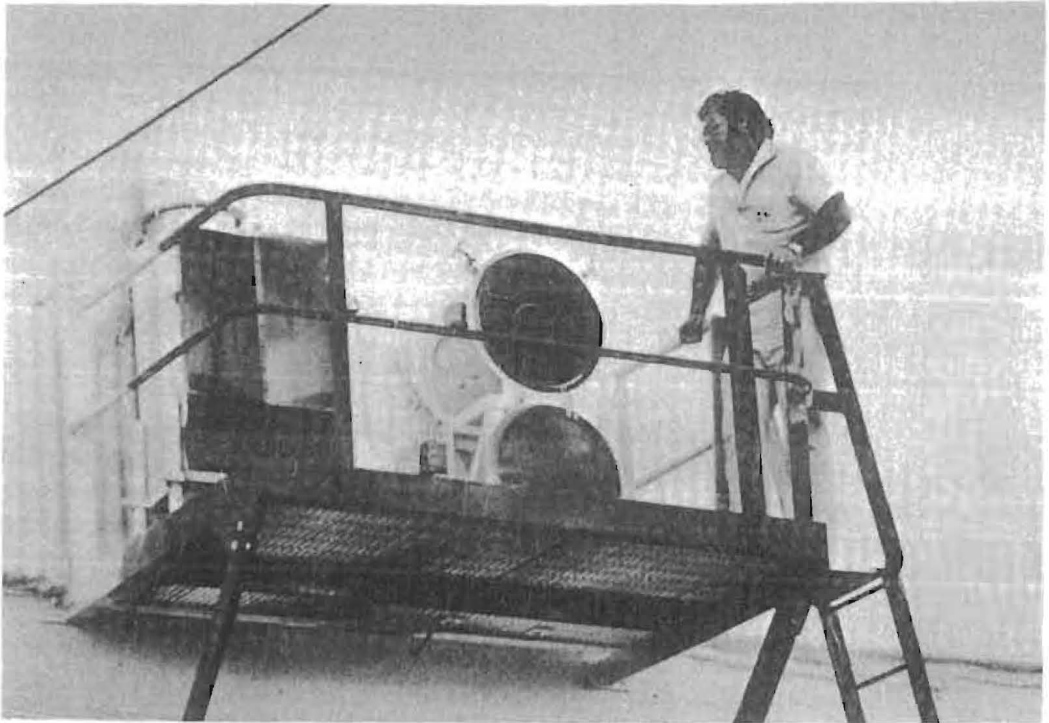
Pressure relief vent and fan built into gable end wall of horizontal storage at Kellerberrin. The fan cover is opened while pressurising the storage and is sealed for the pressure decay and leak detection test.
